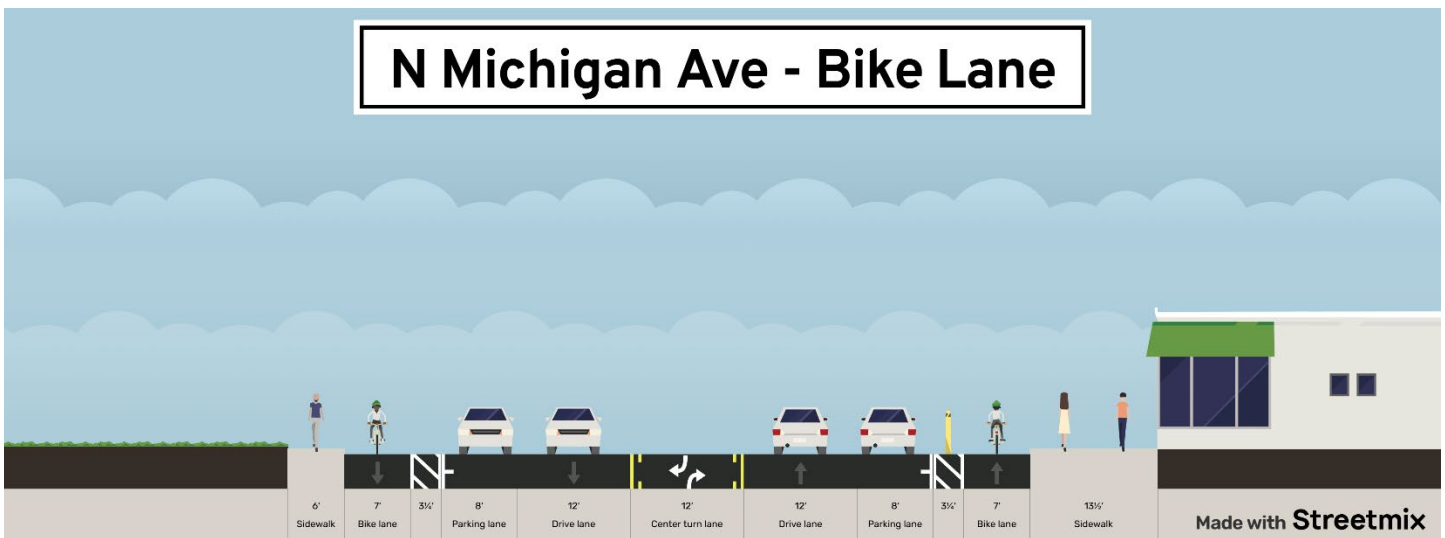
Alternative Cross Section 2A - Road Diet and Bike Lanes
